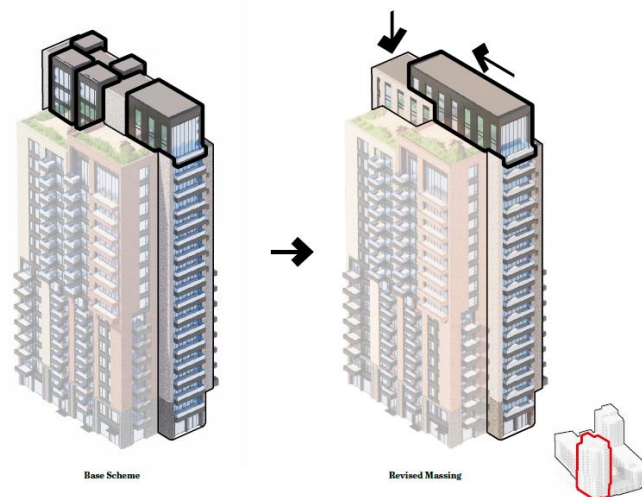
ALTERNATIVE TOP FLOOR EXPRESSIONS
